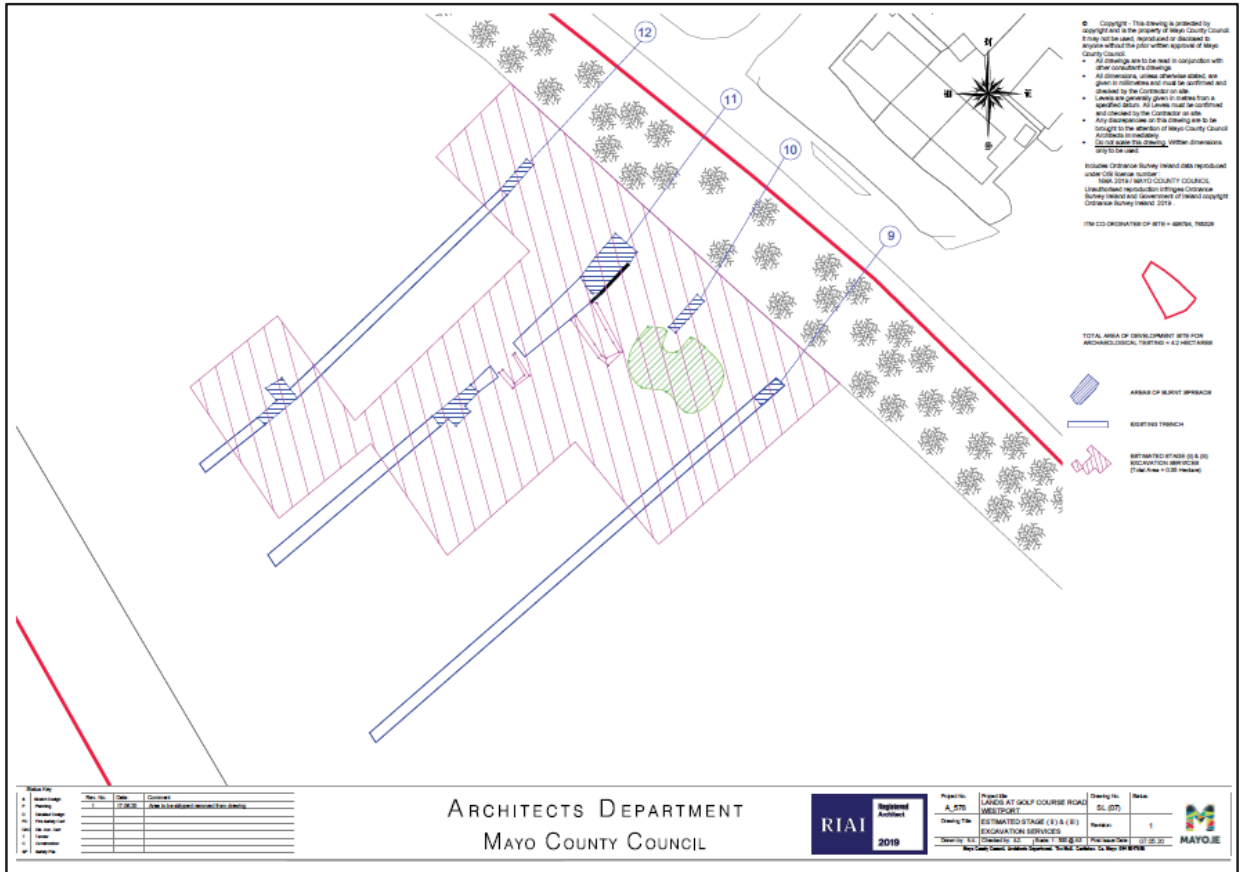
Location of Test Trenches 9, 10, 11 and 12. In Field 1 Areas in blue are the location of burnt stone. Possible fulachta fiadha hatched in green. Wider area of purple hatching shows proposed location of hand investigation prior to full excavation, following consultation with the National Monuments Service and the National Museum of Ireland
